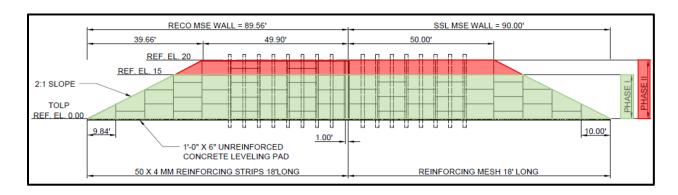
Elevation view of the MSE wall highlighting different phases of construction.
